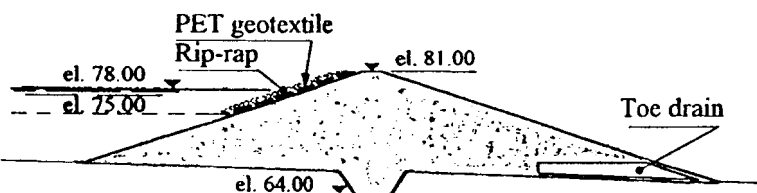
Valcros earth dam in France, 17 m high (tentative reconstruction of the cross-section).
